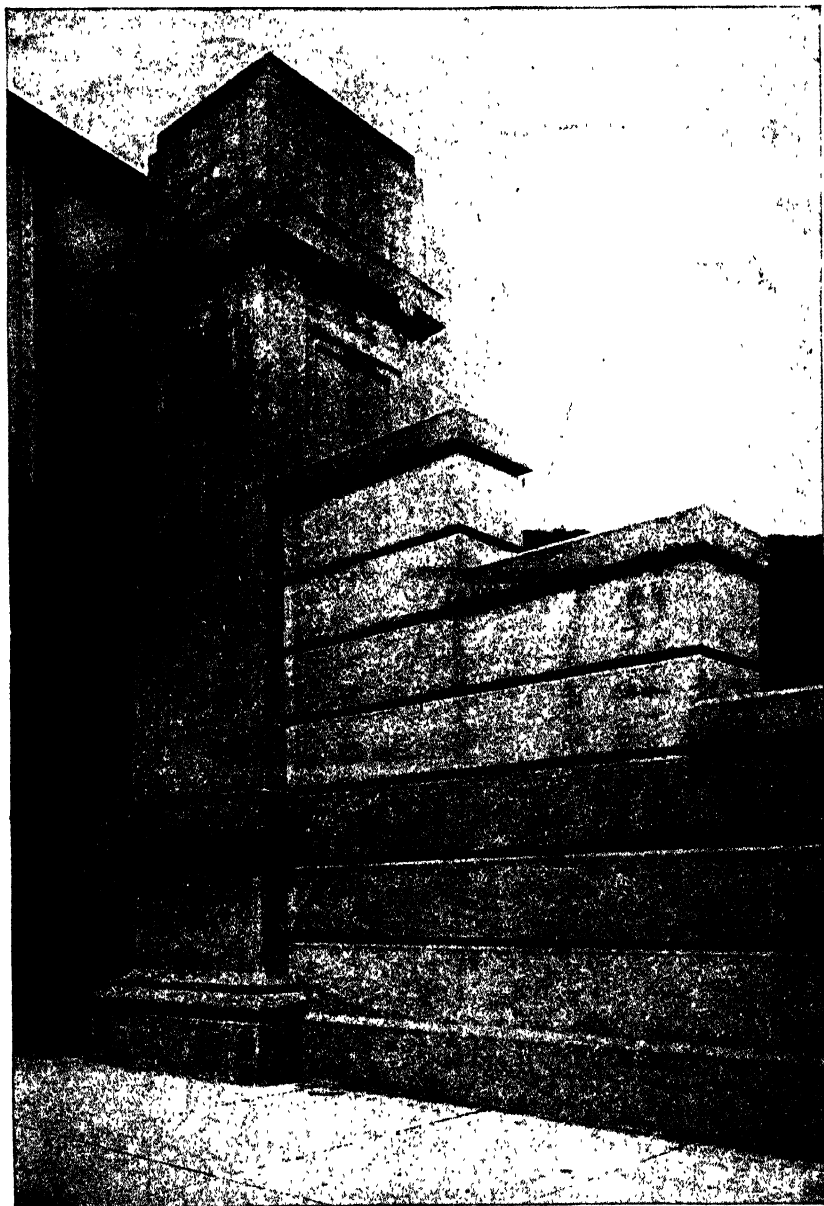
Bridge Abutment with Paneled Surface, Scrubbed. (*See p. 264.*)
